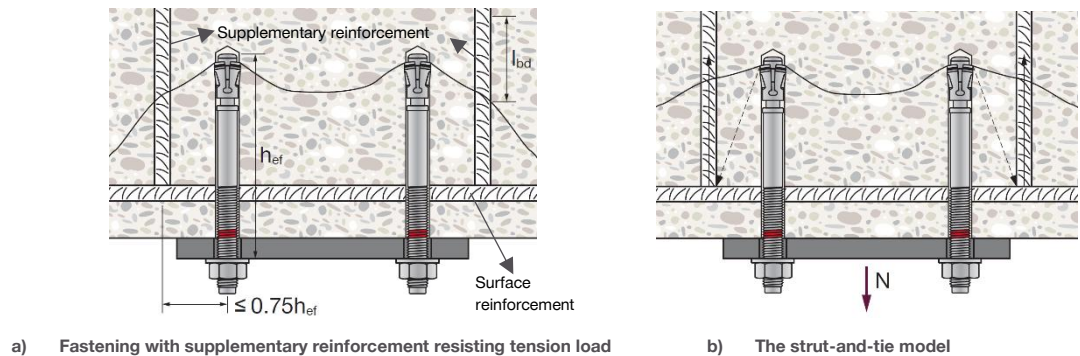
Supplementary reinforcement with post-installed anchors
